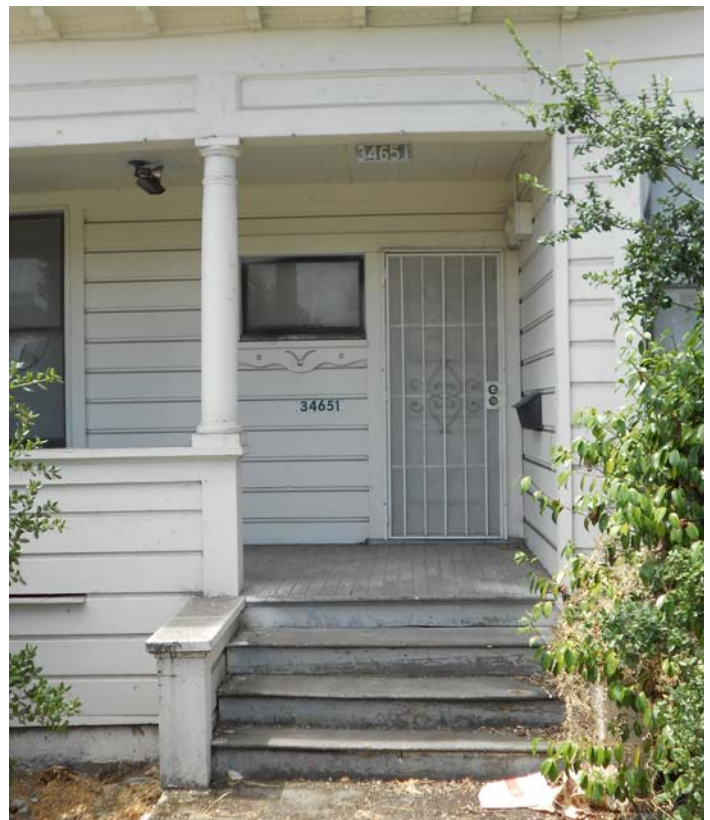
Wood steps leading to front porch and entry are worn and have pulled away from the house. They should be rebuilt matching original and securely attached to the structure. (July, 2014) (S&S)
